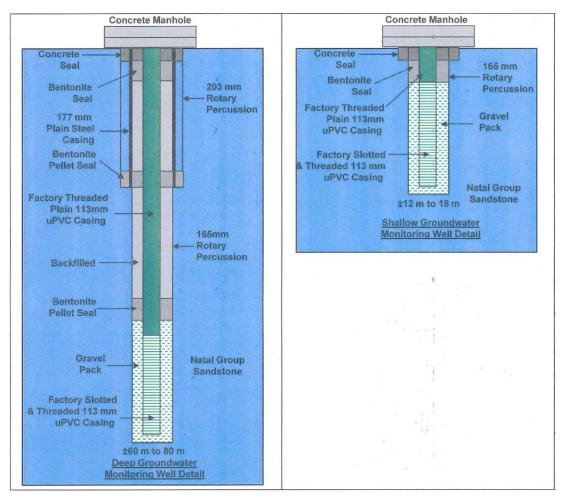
Construction Details for Shallow and Deep Monitoring Wells
